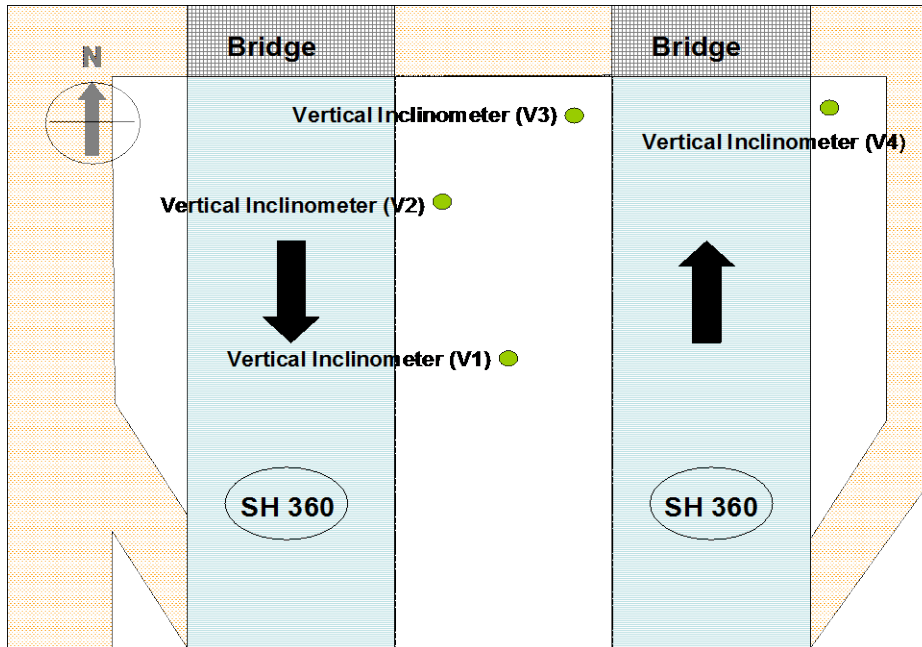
Instrumentation Details on the SH 360 Site, Arlington, Texas.
